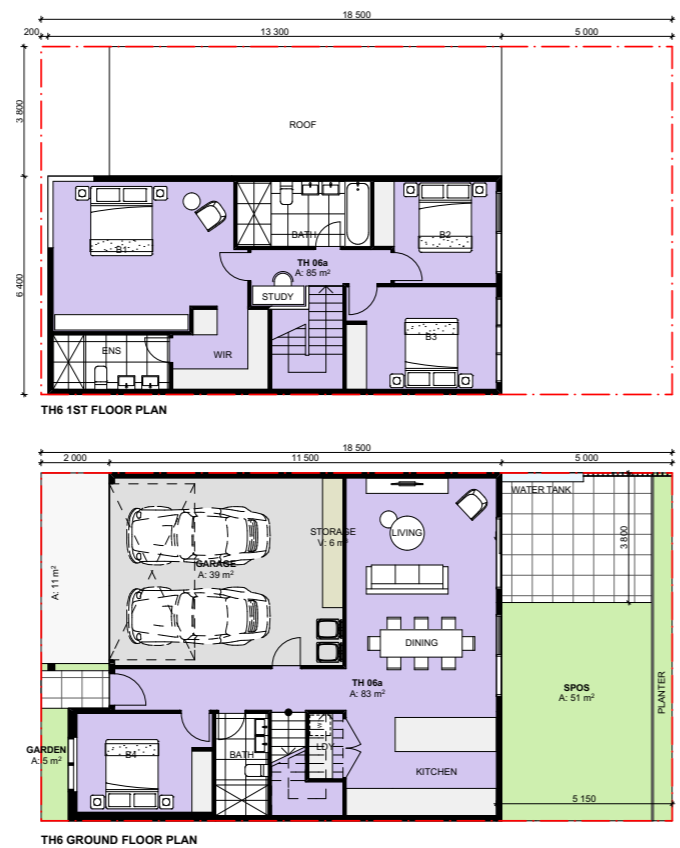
Townhouse Type 6 (Source: Plus Architecture)
